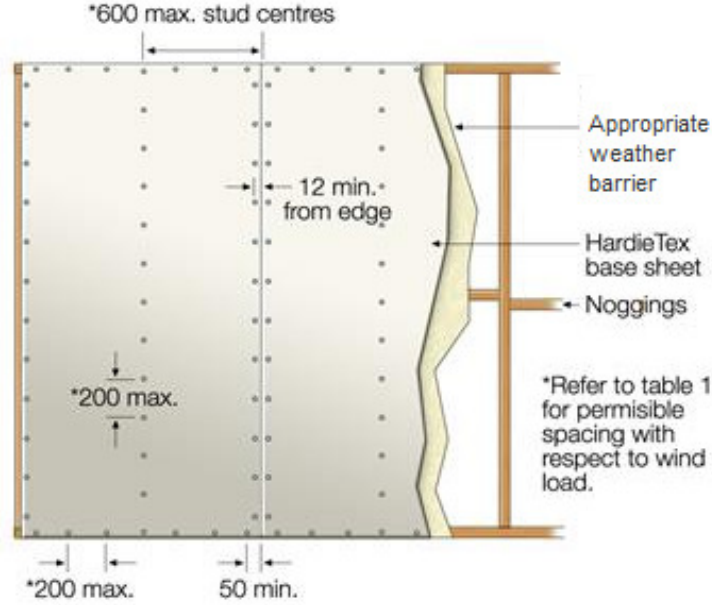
Sheet Fastening Spacing (fixing to noggings not required)
